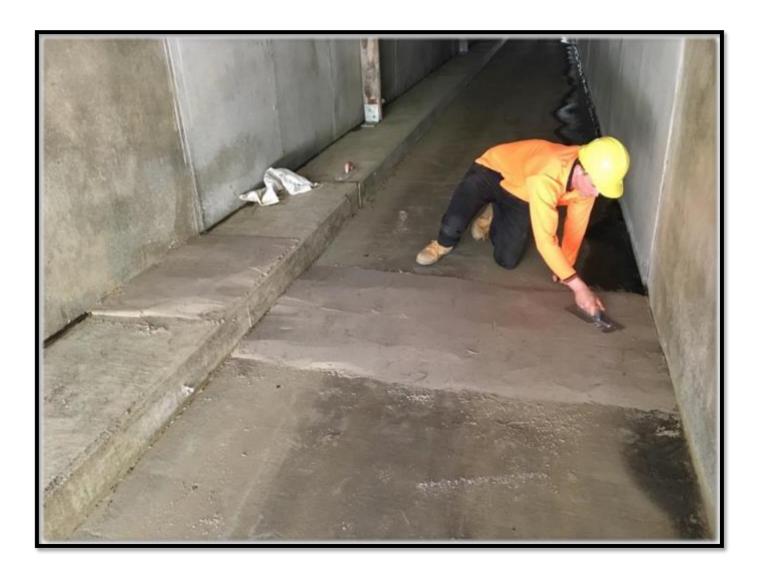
Sand pad being installed in a fauna underpass (Site 3) on the WC2NH upgrade.
